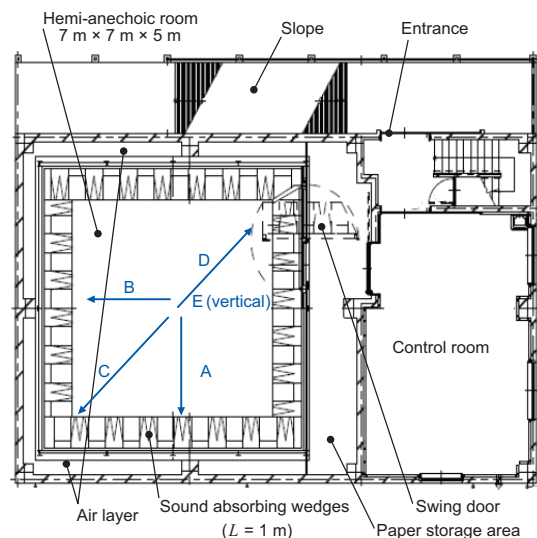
Floor plan of Mizuho Acoustic Test Laboratory.
